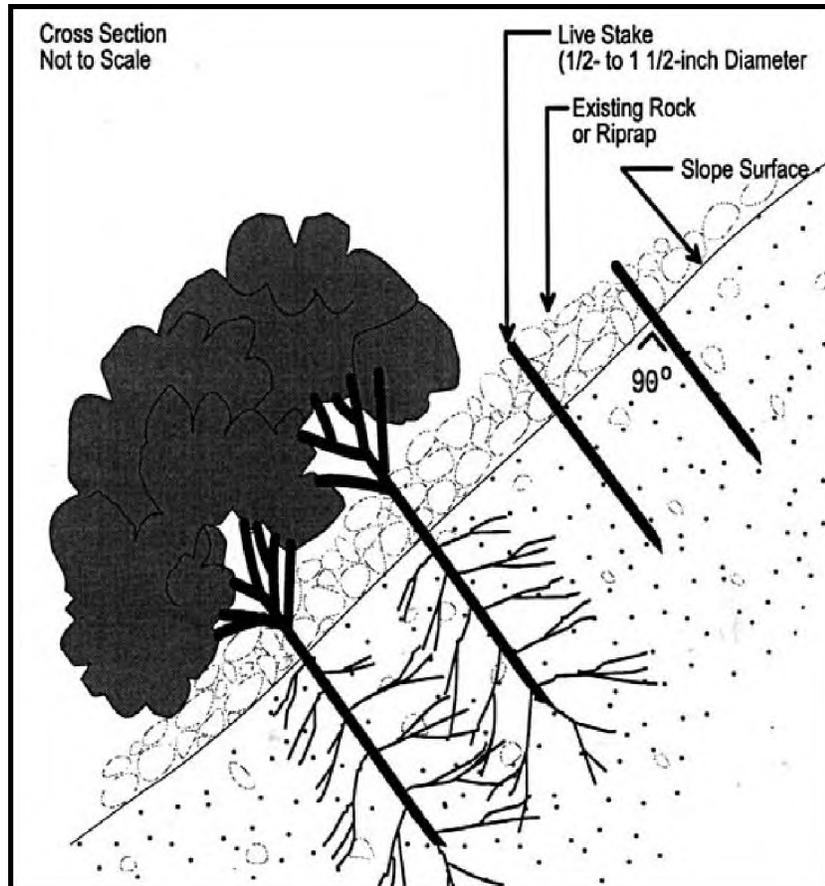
Typical Joint Planting Cross Section Source: *NRCS Engineering Field Handbook*, 1992.
